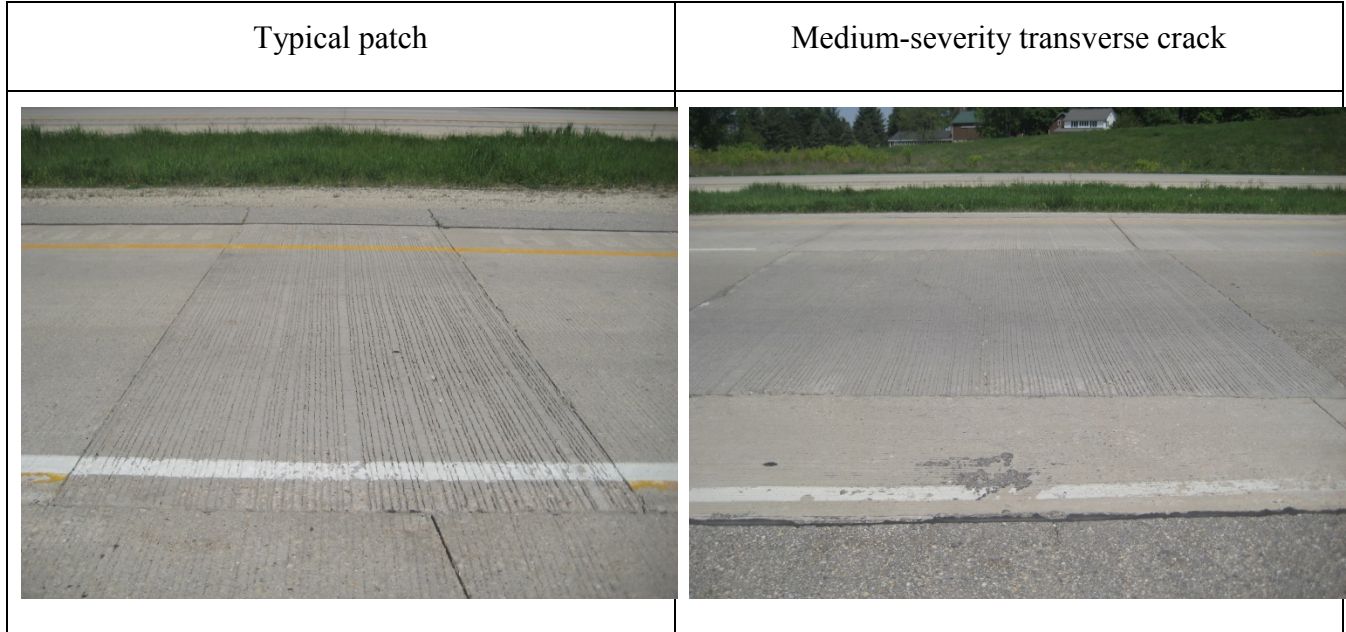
Pictures of typical repaired segments – Project 10 (STH 26)
